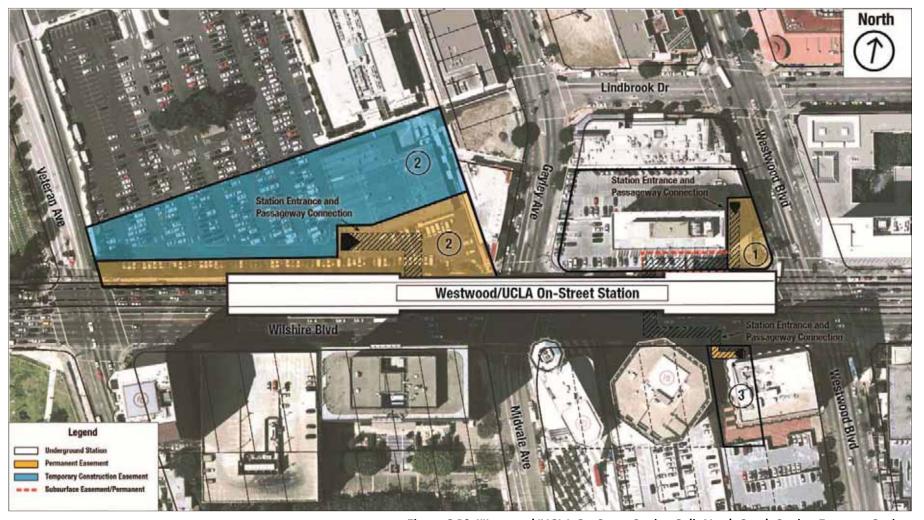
Westwood/UCLA On-Street Station Split North-South Station Entrance Option
